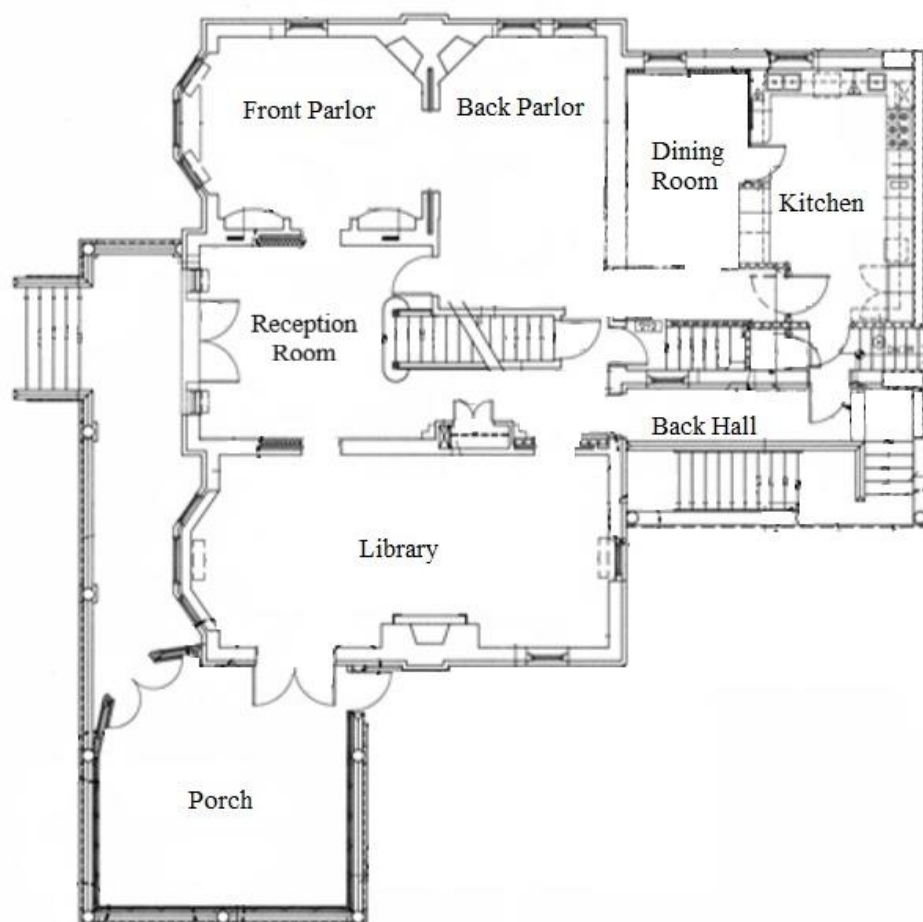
Conjectural first-floor floorplan of Reynolds Cottage based on recent floorplan using room titles listed in the 1923 inventory.
